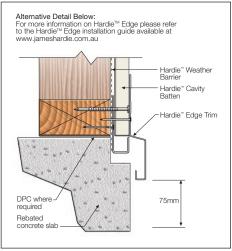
B ALTERNATIVE SLAB EDGE DETAIL
